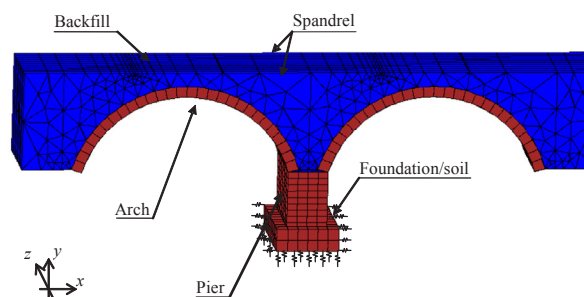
Bridge-foundation-soil model and Winkler-type interfaces.
